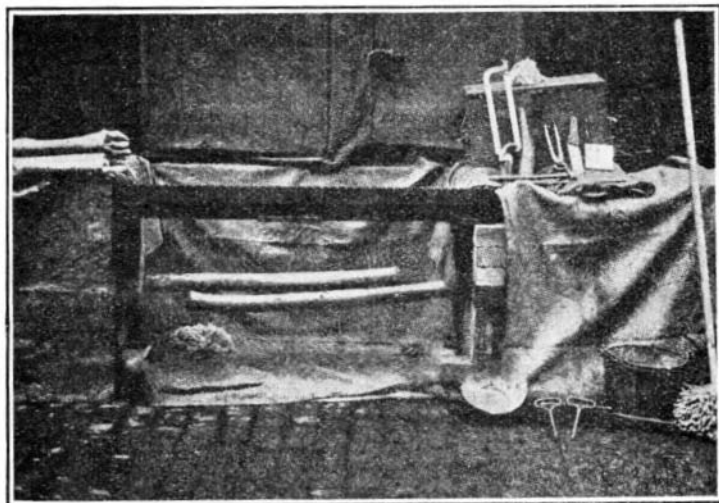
CABLE ENDS IN POSITION FOR JOINTING.
